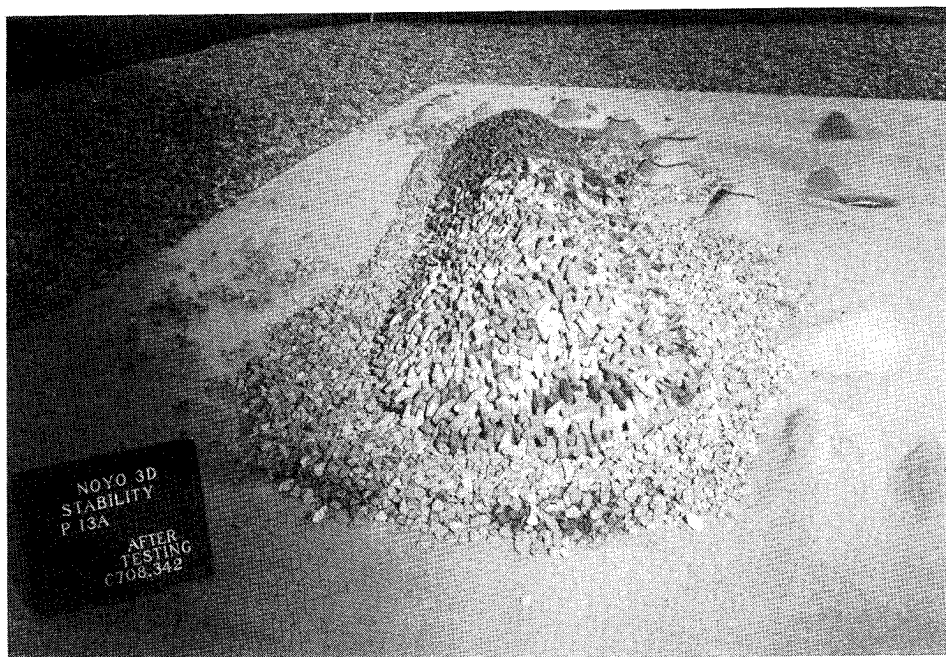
Plan 13, north roundhead after two series of Storm IA waves
